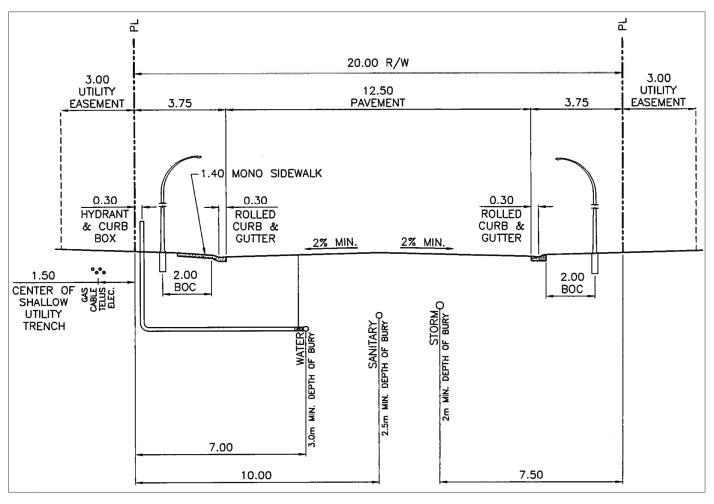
20m R/W Urban Collector Street Cross Section (Drawing No. ST–2 from the Engineering and Development Standards)
